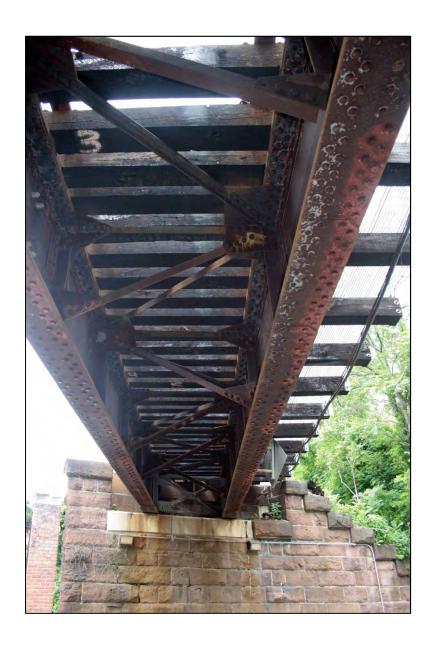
Marshall Street Bridge, west side, camera facing northeast.
